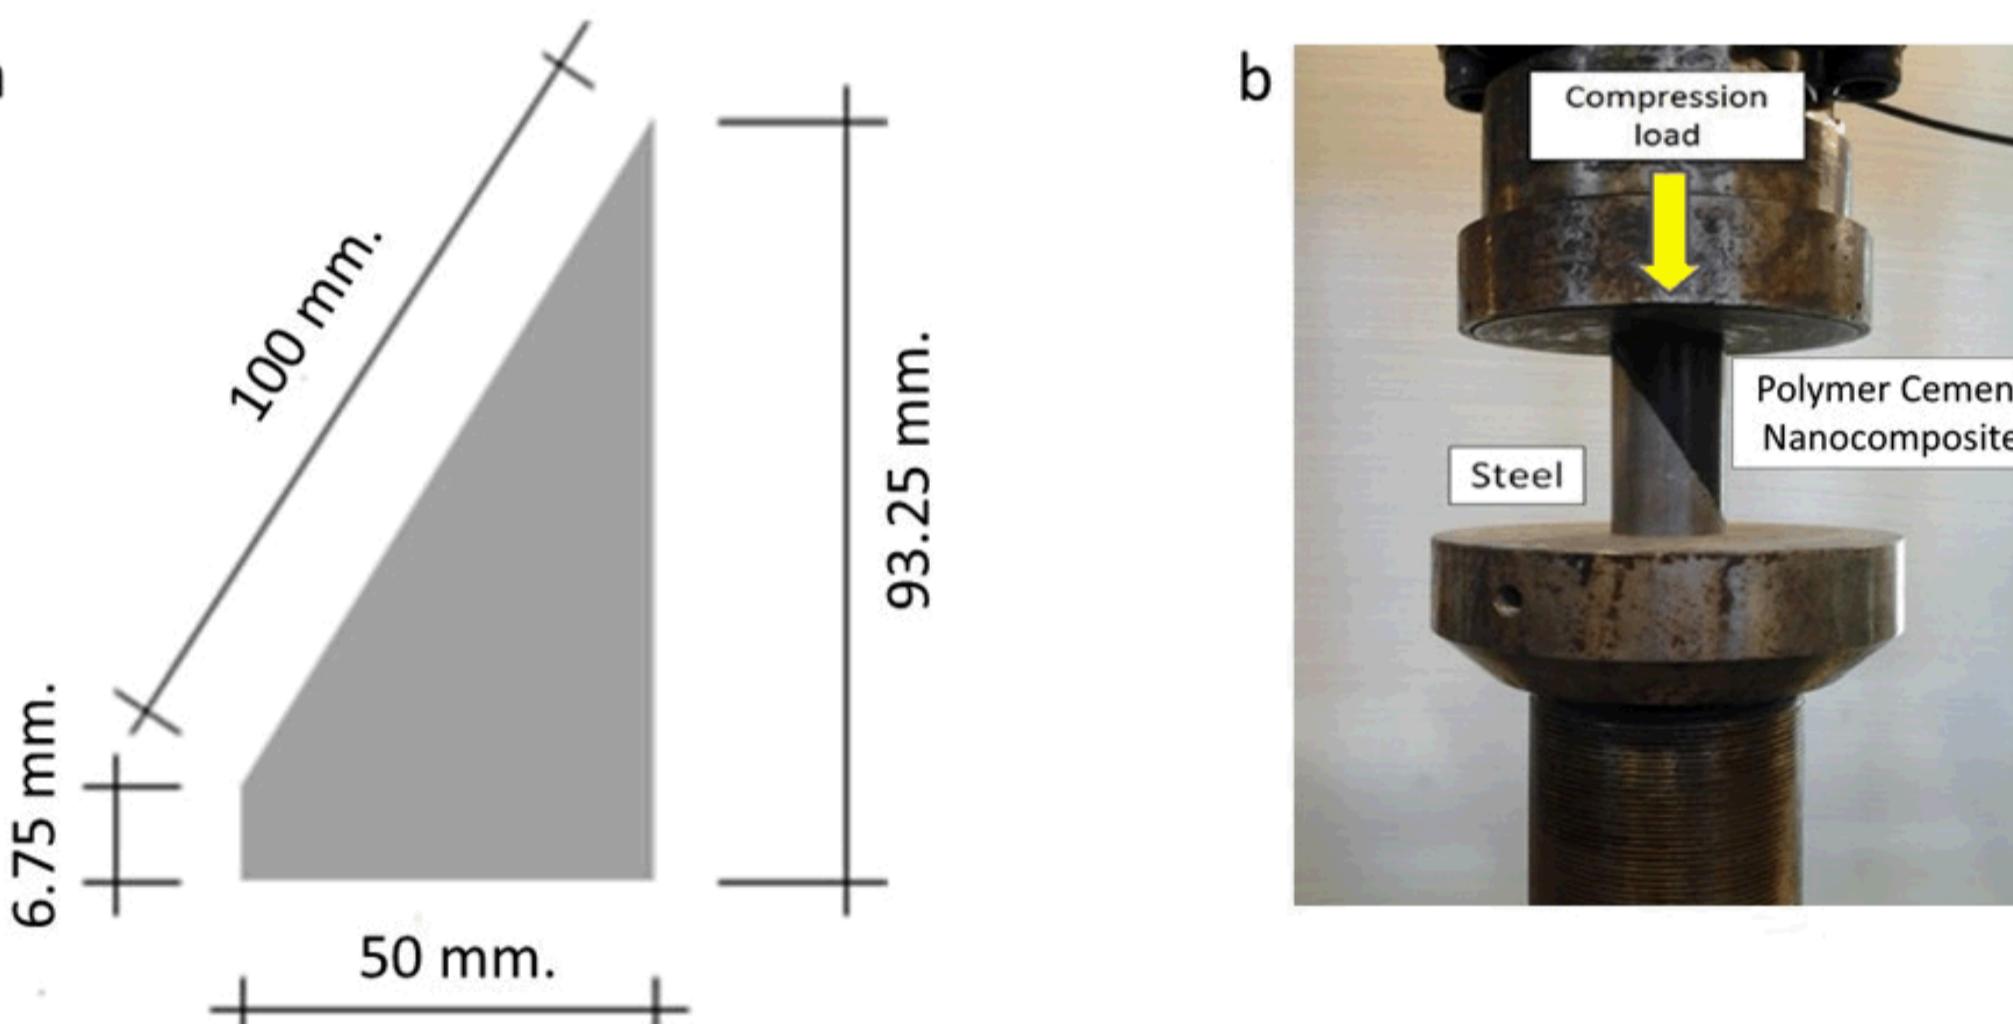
(a) Steel part dimensions (b) Slant shear test setup.
